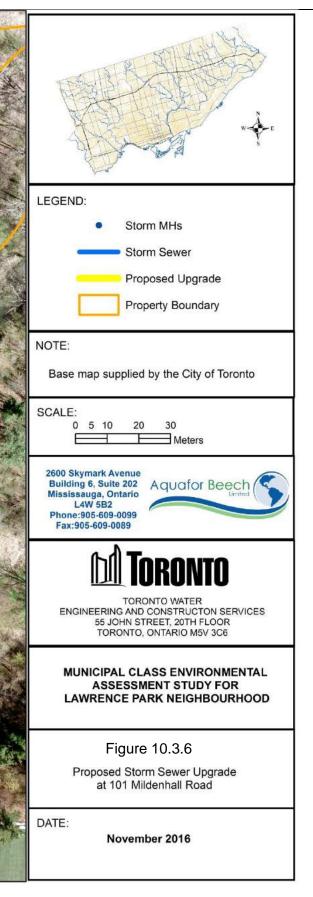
Proposed Storm Sewer Upgrade at 101 Mildenhall Road
